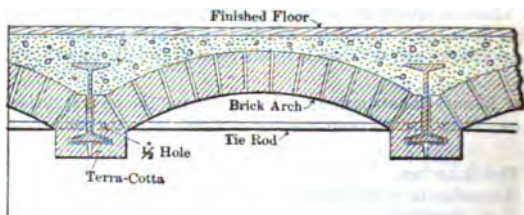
Brick Floor-arch. Government Printing Office, Washington, D. C.
